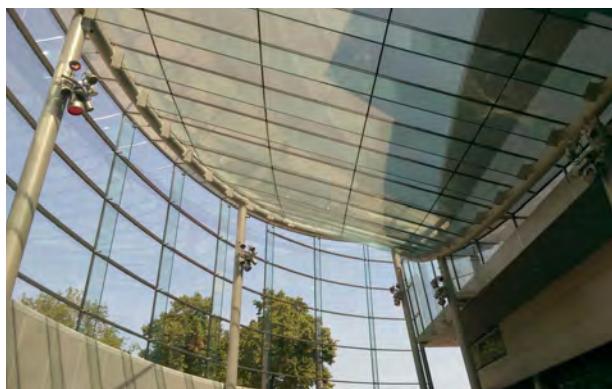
Roof and facade of the Van Gogh Museum in Amsterdam
